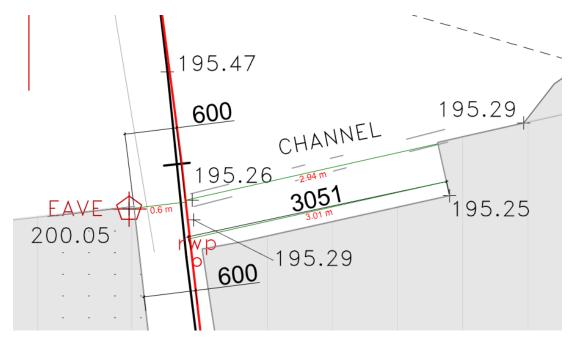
Extract from submitted Topographical survey showing width between house and existing bungalow. It is suggested ownership by the neighbour extends to 600mm from the side wall as shown. Officer measurements shown light green. The remaining extent leaves at worst 2.94m. These measurements reflect Officer's on site measurements.
